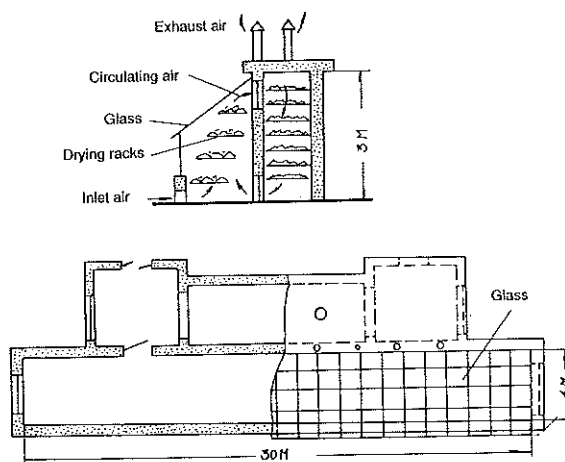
Cross-sectional and plan views of a Chinese dryer.
